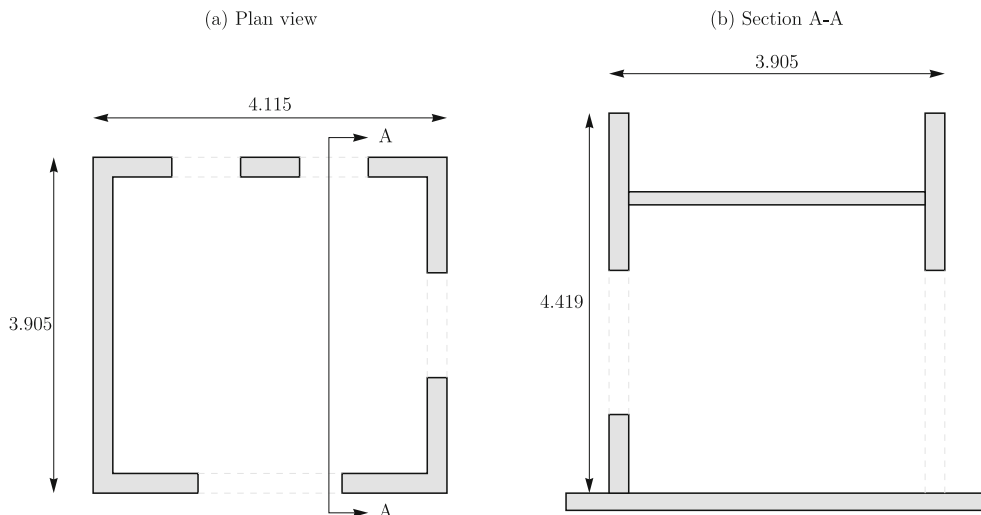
Plan view (a) and vertical cross section (b) of the one-storey masonry building taken as reference. For further details, see [63]
